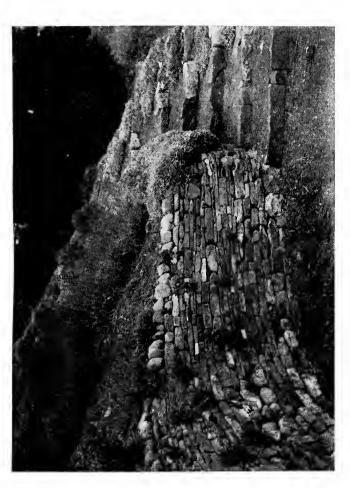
A DRY WALL SHORTLY AFTER CONSTRUCTION.
